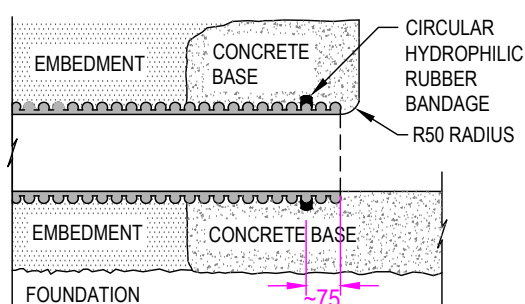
E: PP PIPE CONNECTION (SECTION VIEW)
